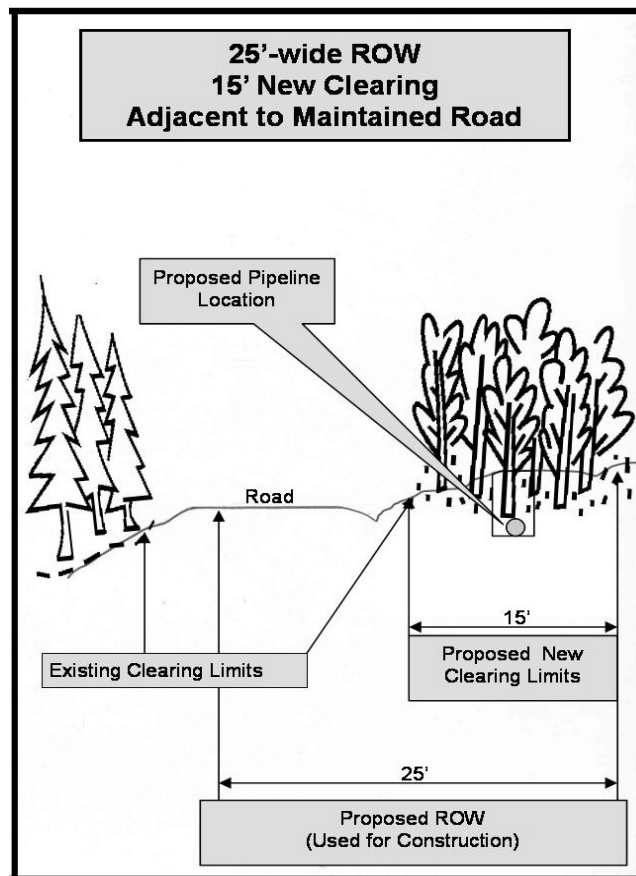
25' Right-of-way New Clearing Adjacent to Road
